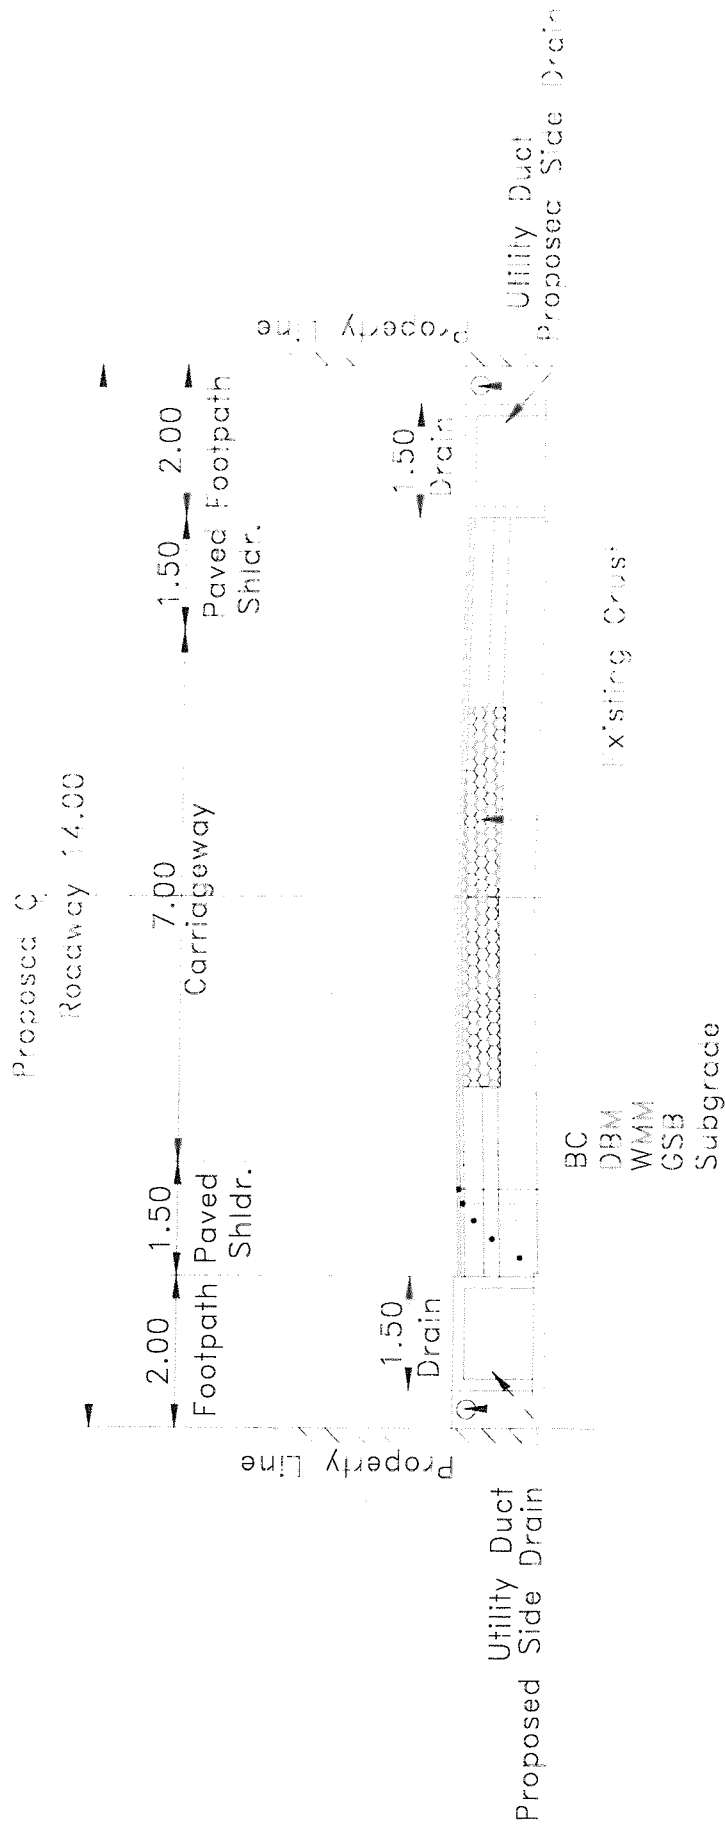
TYPICAL CROSS SECTION OF PAVEMENT IN BUILT-UP AREA
